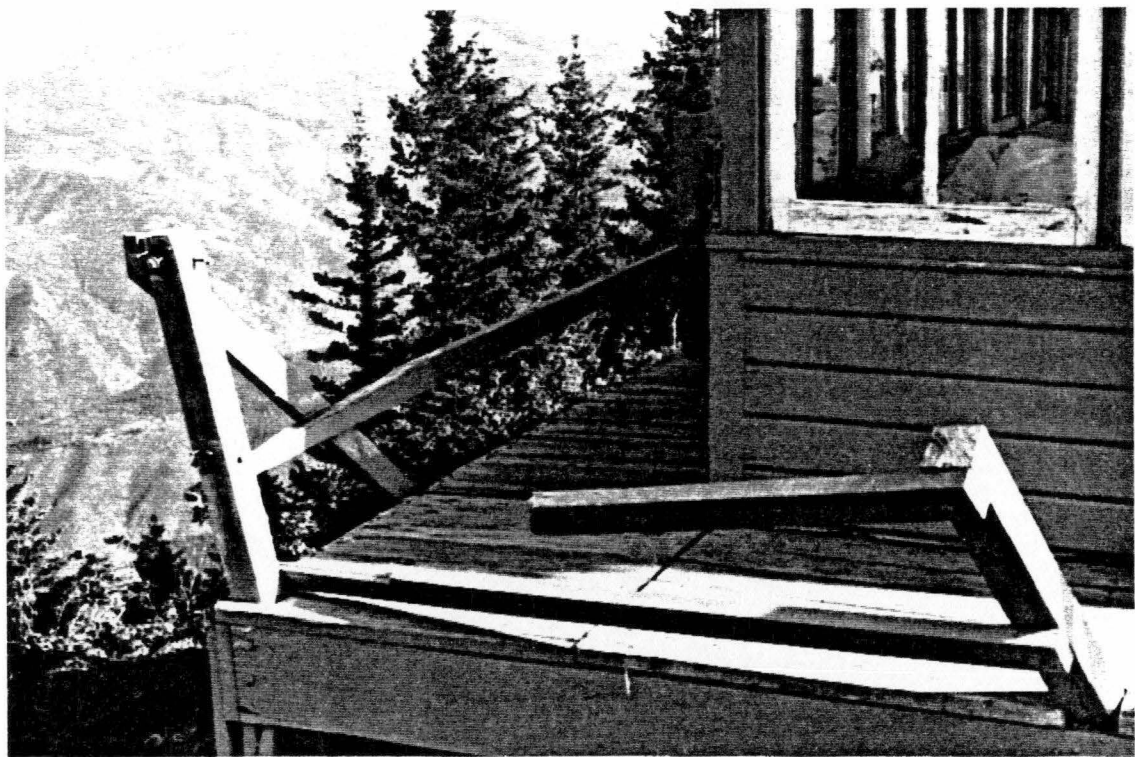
Broken Railing and Support At Northeast Corner of Catwalk. Gold Butte Lookout Station, 1991. Source: Author.
